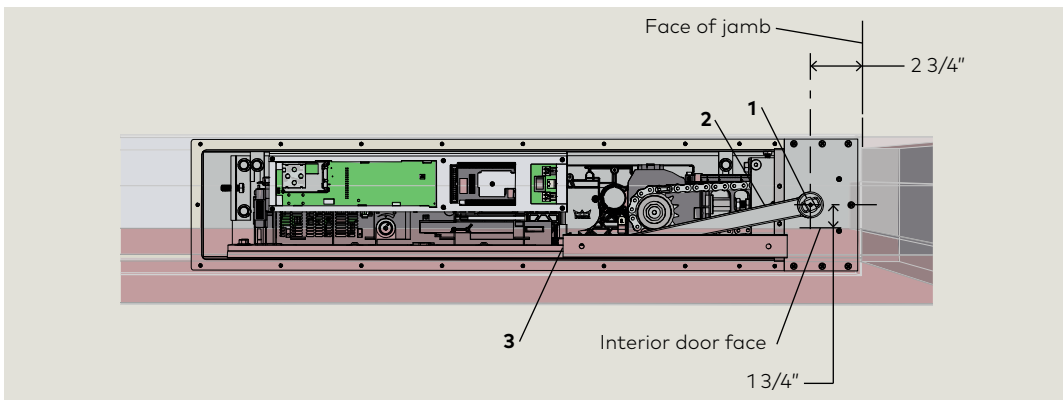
LH slide arm and track, alignment of spindle with door face overhead view
